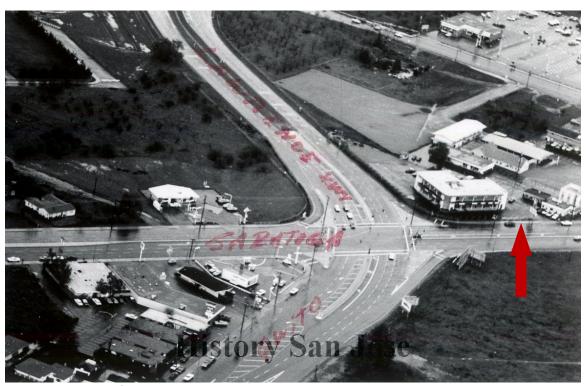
The intersection of Saratoga Avenue and Lawrence Expressway in 1967. The subject site indicated by red arrow. History San Jose Collections, Catalog No. 2013-32-106.
